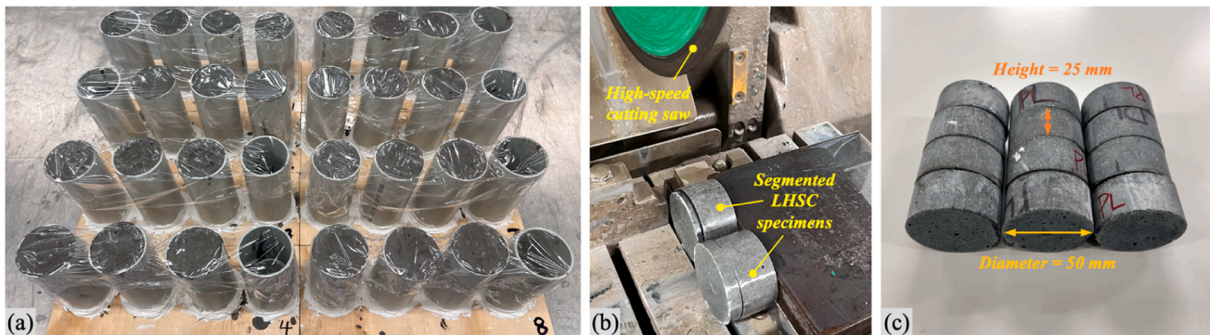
(a) LHSC mixtures casted in PVC moulds and (b-c) segmented specimens prior to testing.
